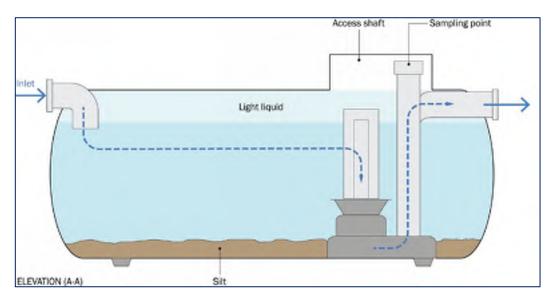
Typical Section Detail of Fuel Separator (CIRIA C753)
